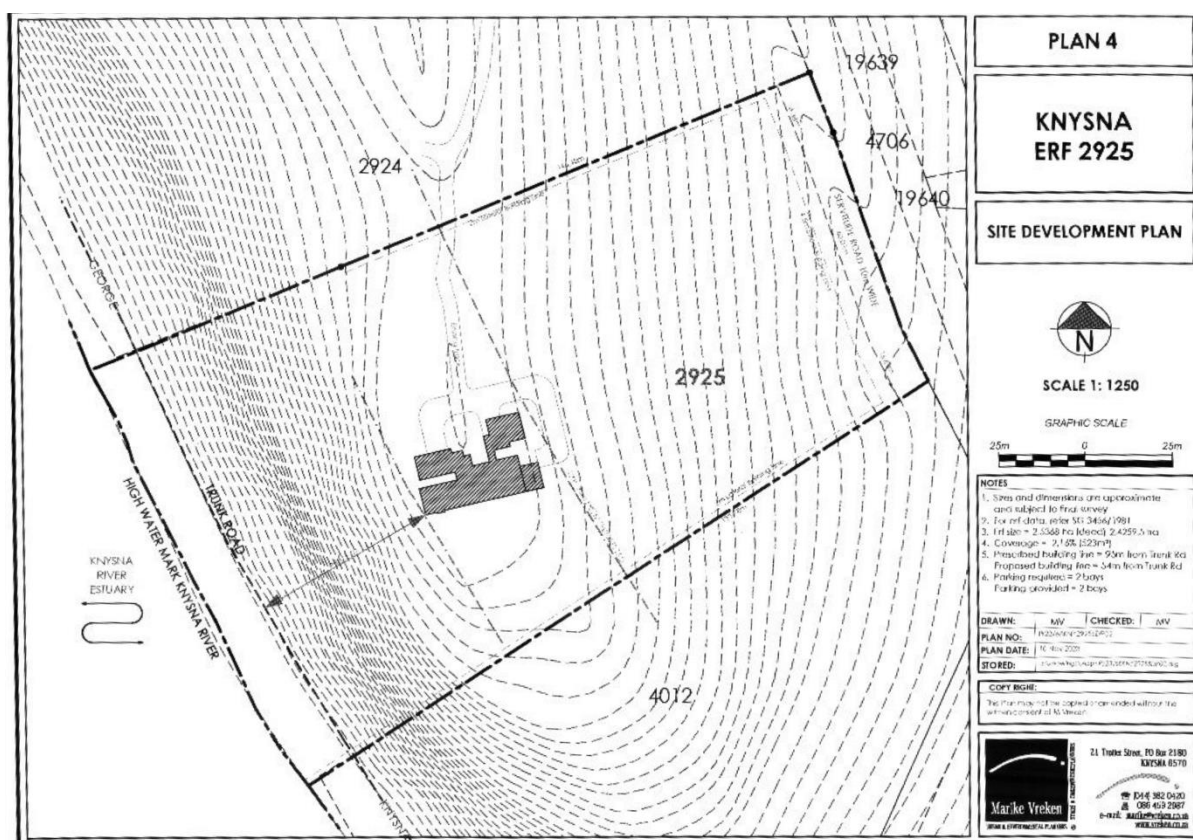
Proposed development plan for the single dwelling on Erf 2925
